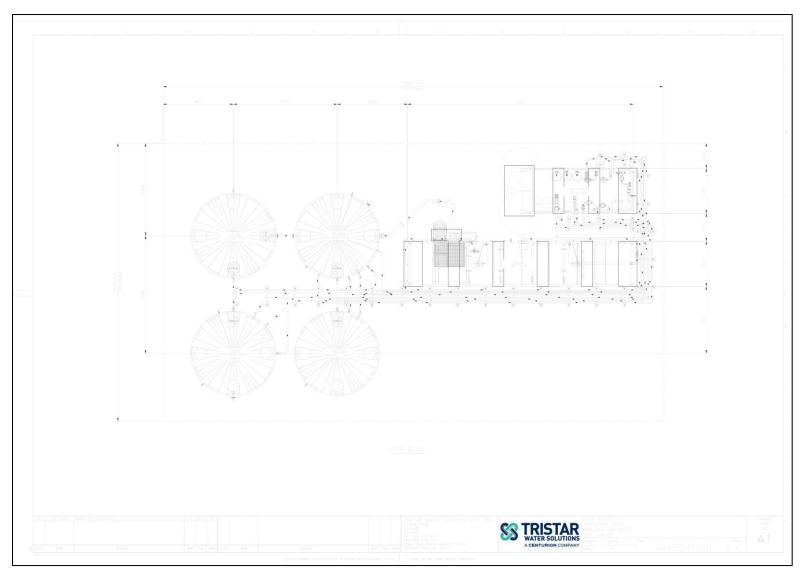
Design layout of Tristar Sequential Batch Reactor WWTP
